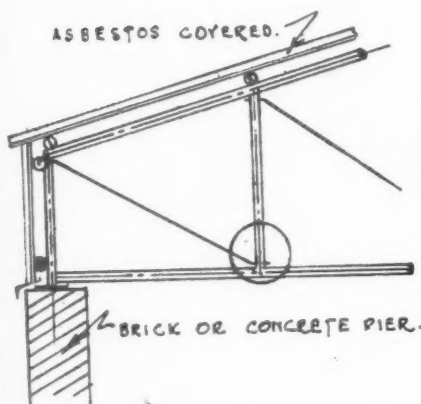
Girder type roof principle as applied to brick or concrete construction.
